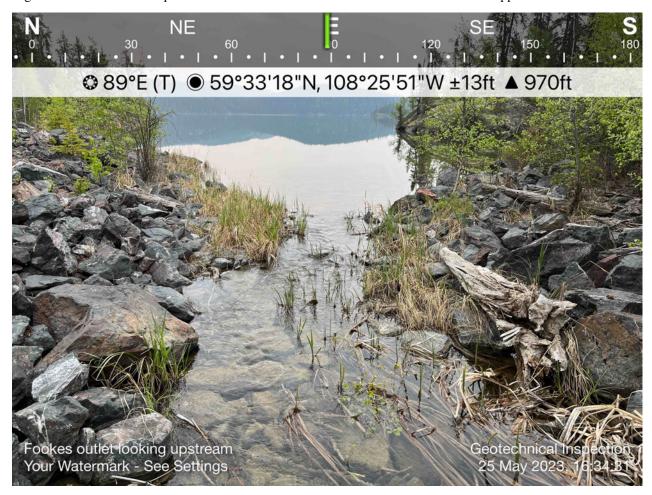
Fookes Reservoir Spillway looking into Fookes Reservoir
